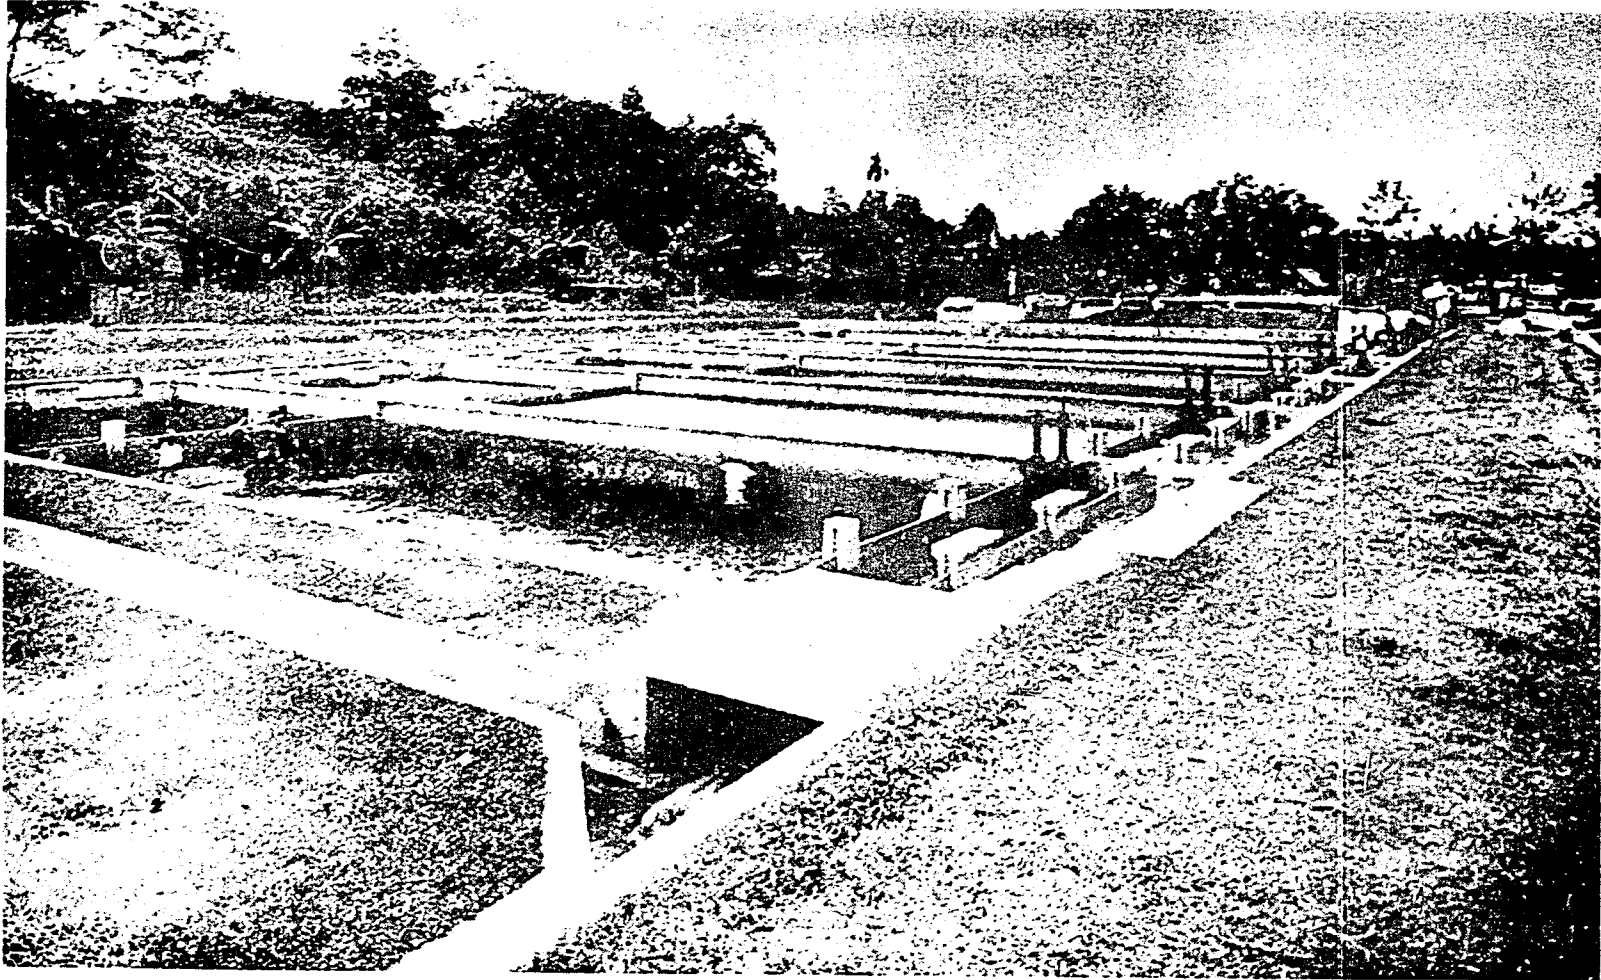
B. Sewage Disposal Works, Alexandra Road. New Humus Tanks (From Filter Beds Blocks C & D). Humus Sludge Drying Beds and Pump House. (Under Construction) Taken 9-1-30.
